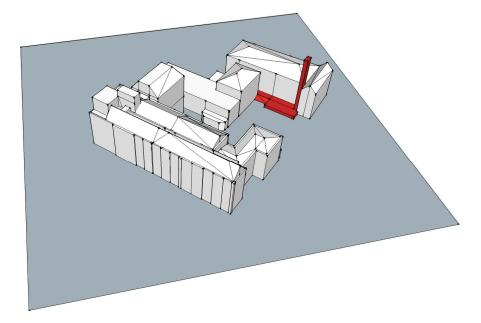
A NEW BOILER HOUSE AND CHIMNEY ARE CONSTRUCTED IN 1951. ILLUSTRATION BY AUTHOR.
